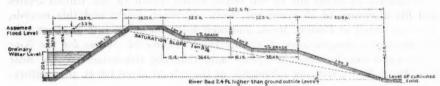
TYPICAL SECTION OF LEVEE ON RIGHT SIDE OF THE ADIGE RIVER.
